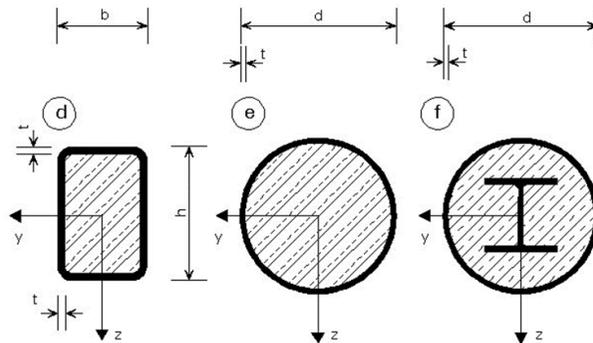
Composite Column Types, d) Rectangular Hollow Steel Section Filled with Concrete, e) Circular Hollow Steel Section Filled with Concrete, f) Circular Hollow Steel Section Filled with Concrete with Embedded I Steel Section [70]
